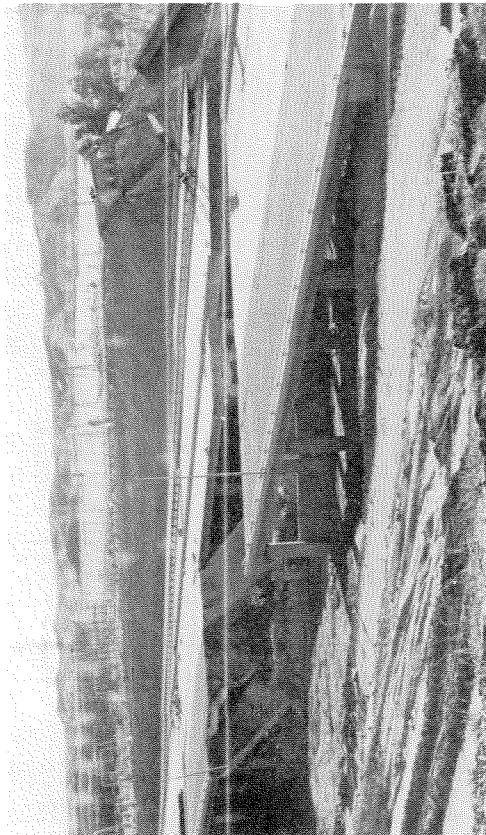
San Fernando Road overhead, looking southwest, Golden State-Foothill freeway interchange.
